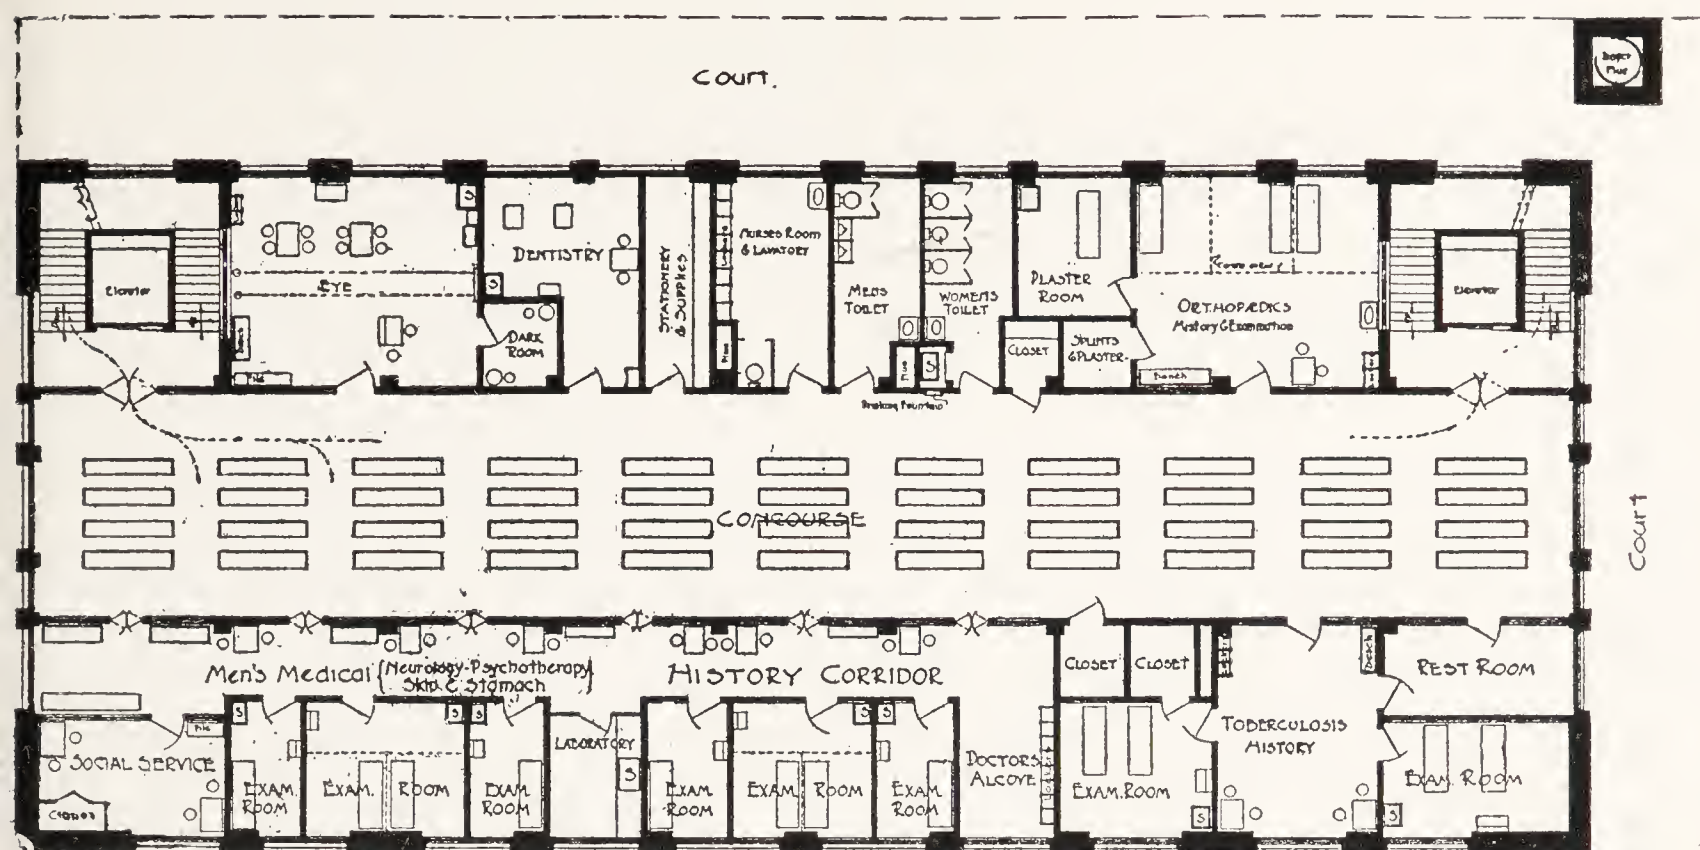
THIRD FLOOR, PROPOSED OUT-PATIENT DEPARTMENT FOR NEW YORK CITY
